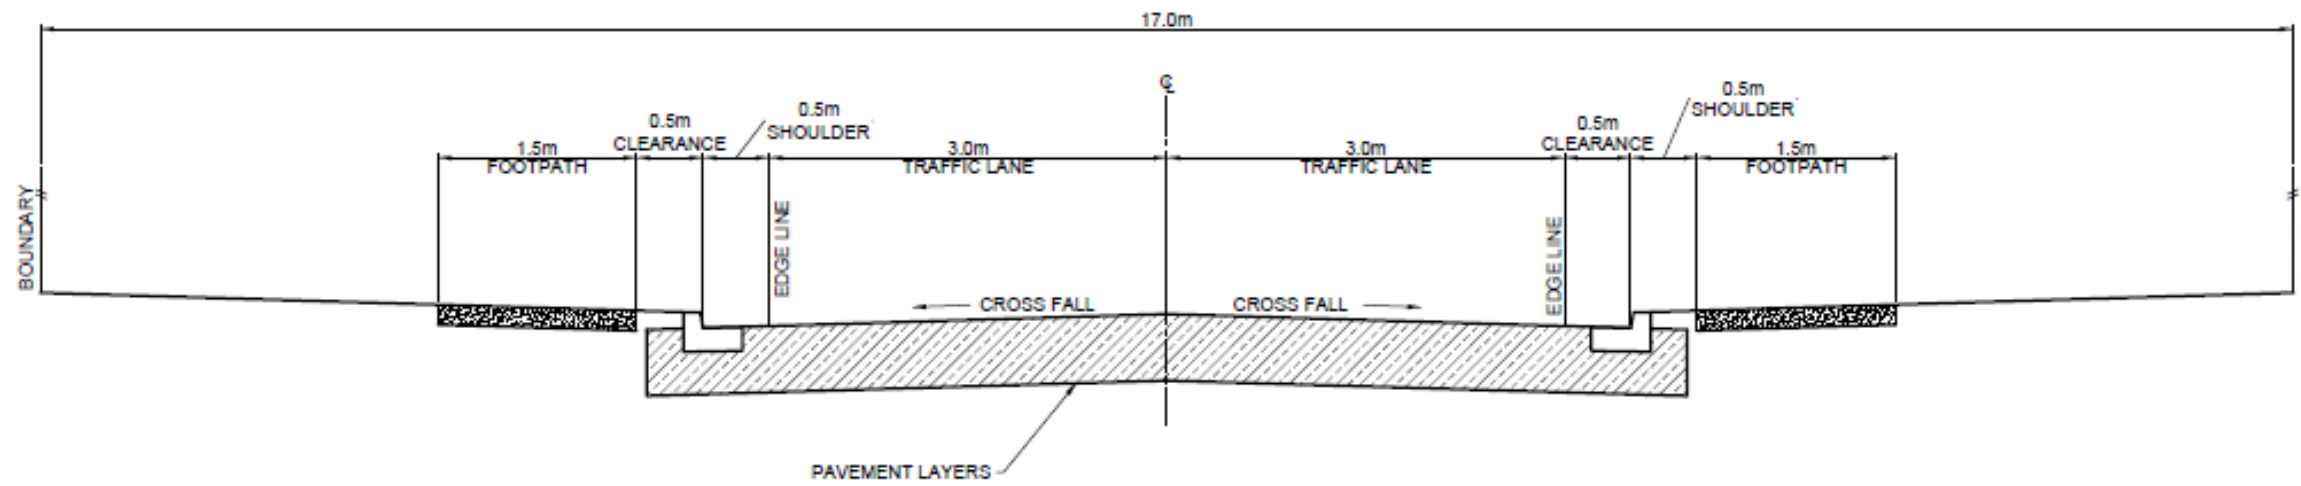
Lorenzen Bay Structure Plan - Road cross sections
